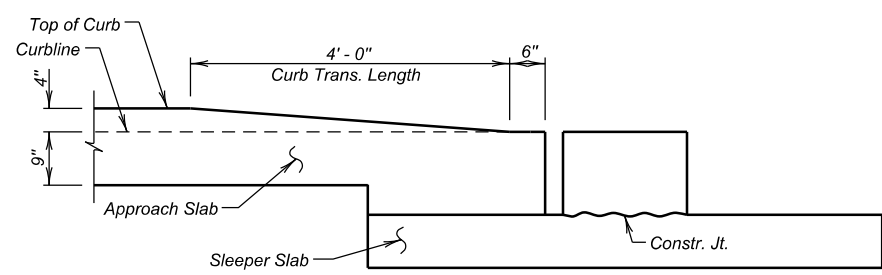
DETAILS OF APPROACH SLAB ADJACENT TO BRIDGE (B)
